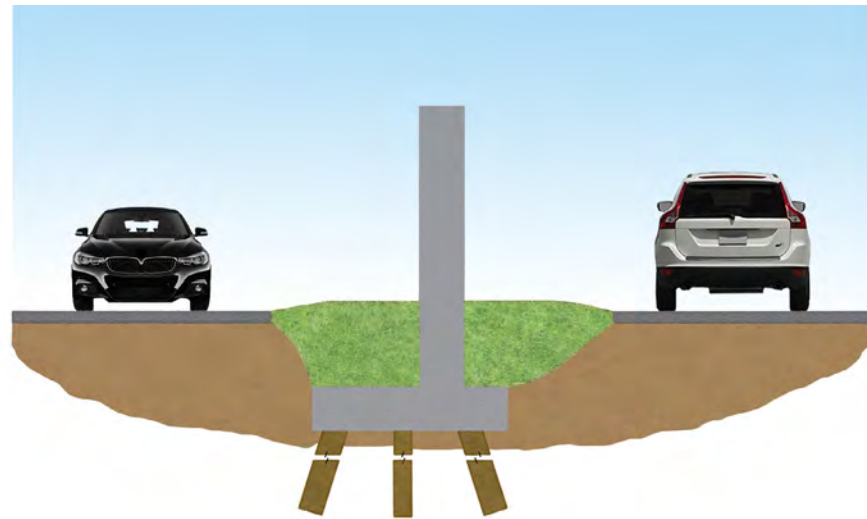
Eden Isle Levee – South Concrete T-Wall Looking East
